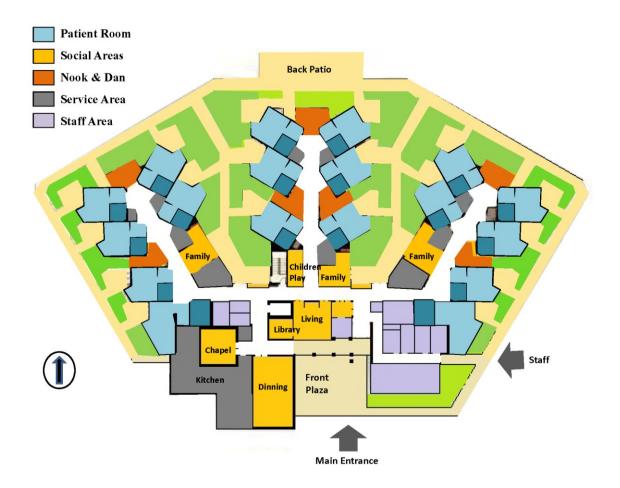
The building layout of Case-3. It shows the south side main entrance, three pods or wings. Each pod has six patients room, two nooks, one den. This figure is produced by Sharmin Kader from the building layout with permission.
